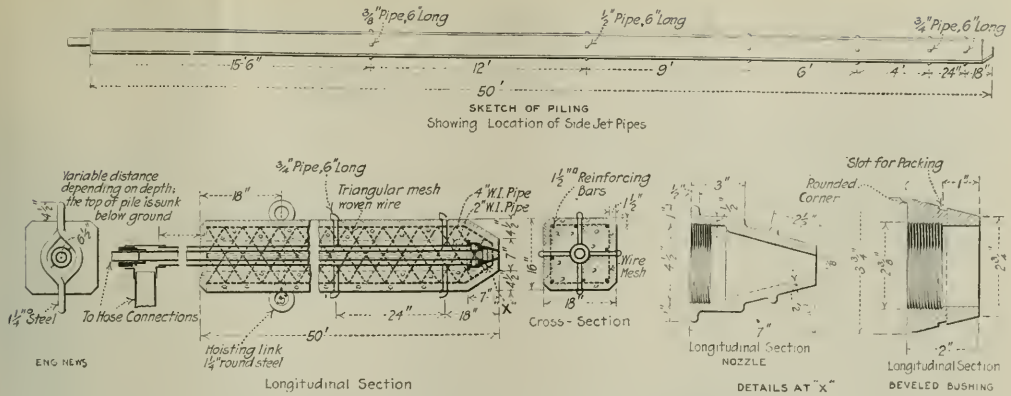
DETAILS OF THE BIGNELL REINFORCED-CONCRETE PILE
